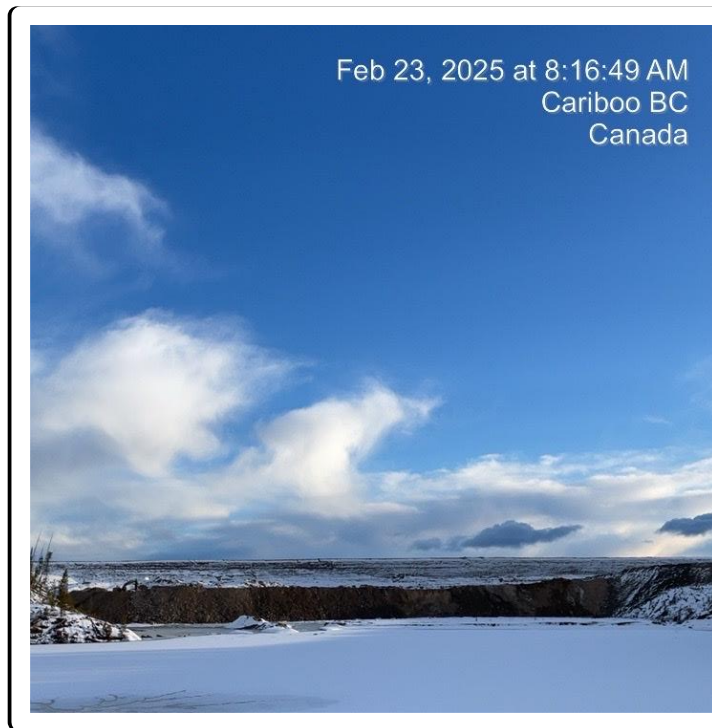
Potential Acid Generating (PAG) Dump at TSF
